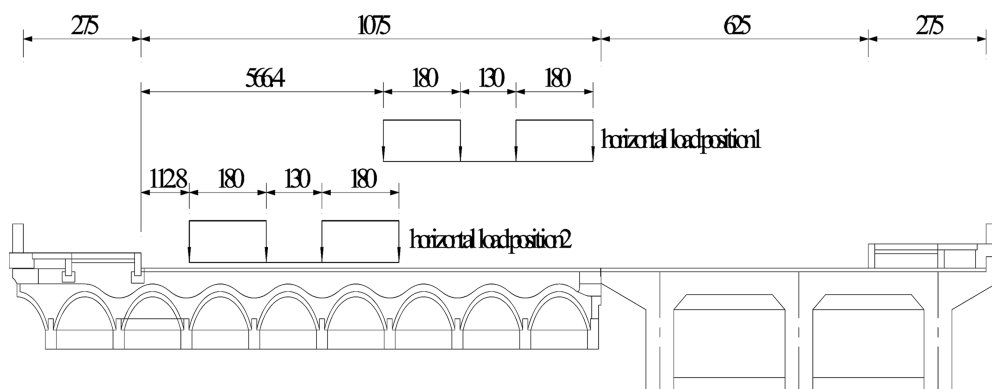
Transverse layout of vehicles loads of the new arch bridge
